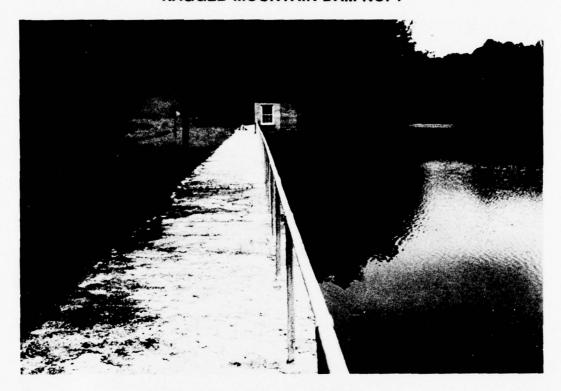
View of Dam Crest, Gate House and Reservoir From Left Abutment
